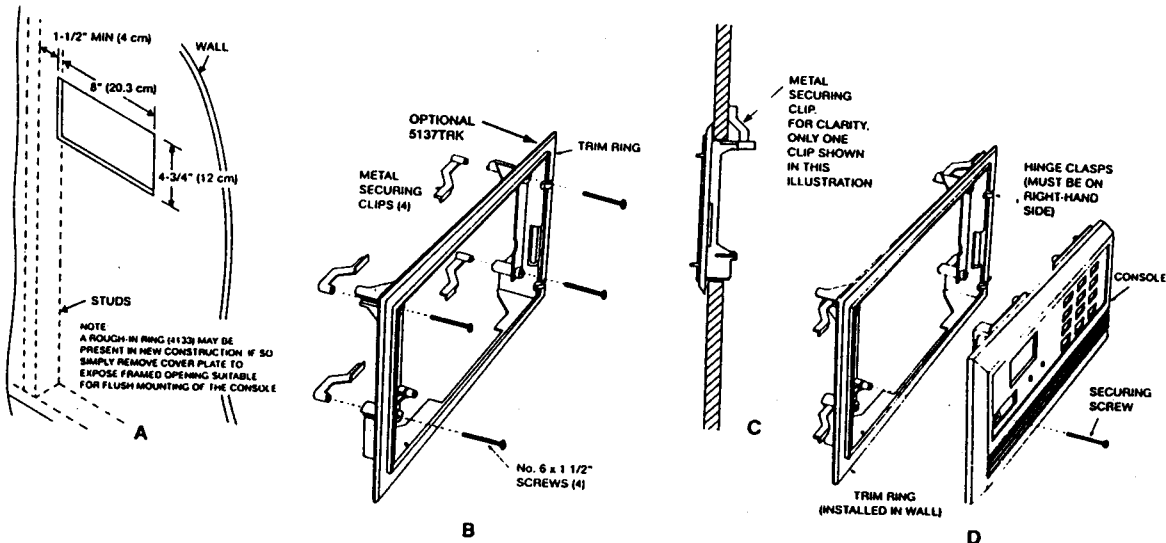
FLUSH MOUNTING THE REMOTE KEYPADS
